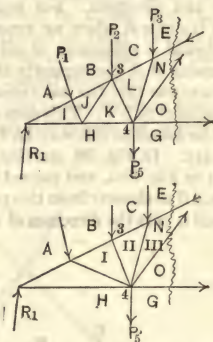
Unsymmetrical Truss. Truss-diagrams
